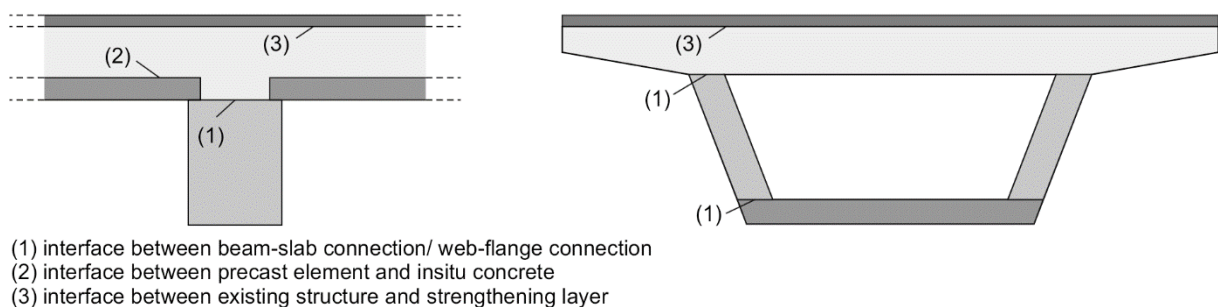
Interfaces in concrete construction: (a) structural joints, (b) joints between structural element and layer of concrete strengthening
